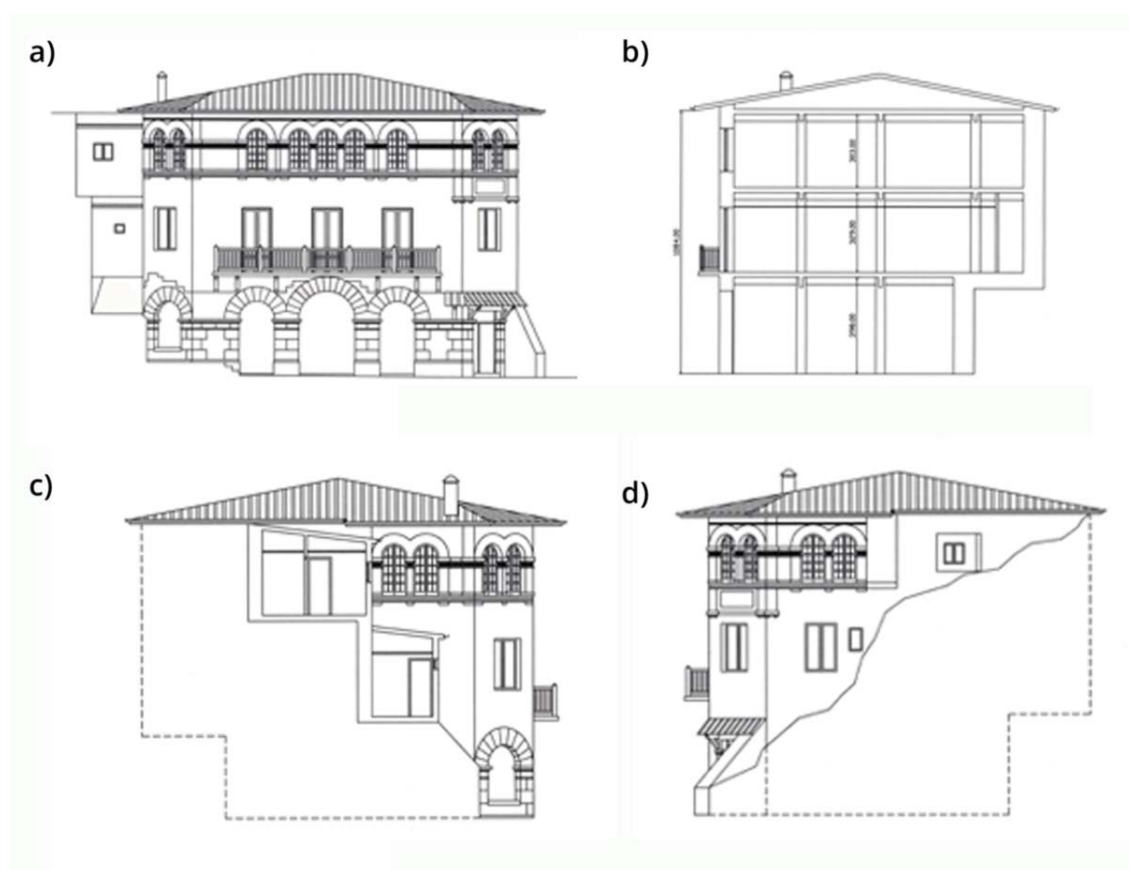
Elevation and cross-section planes. a) South facade. b) cross-section. c) West facade. d) East facade.
